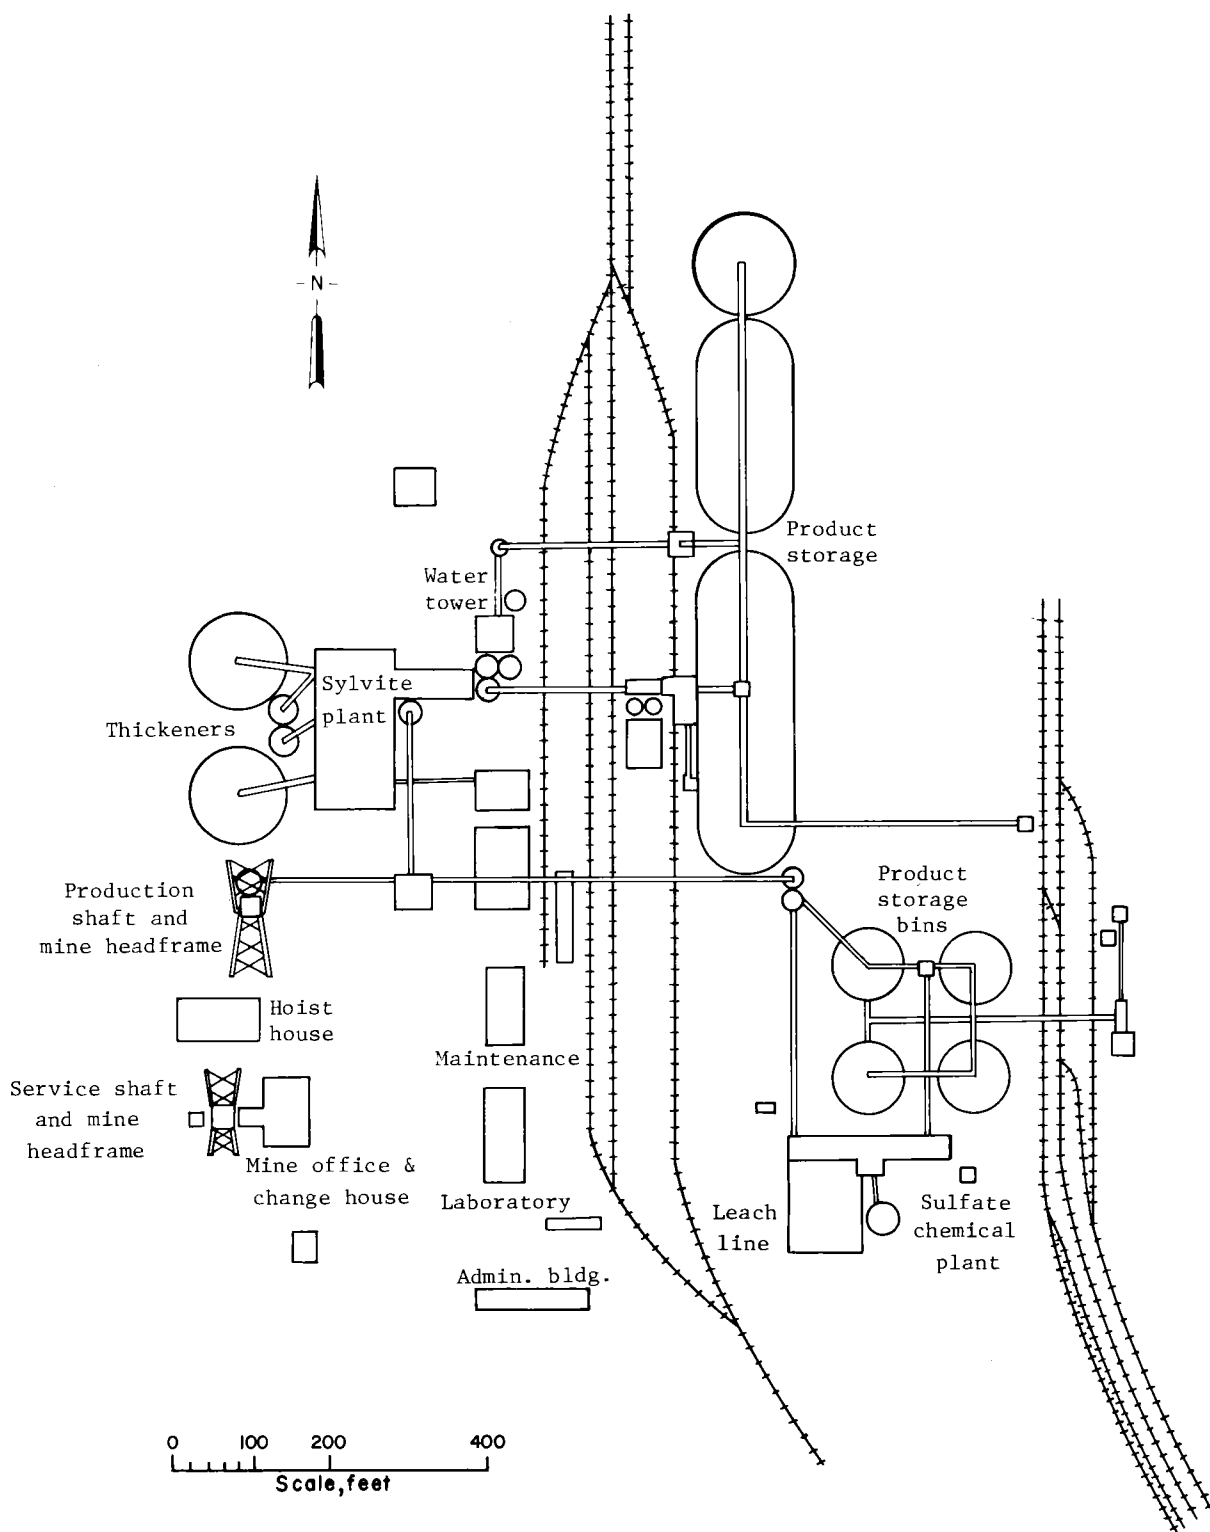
Generalized layout of 7,000-tpd surface plant.
